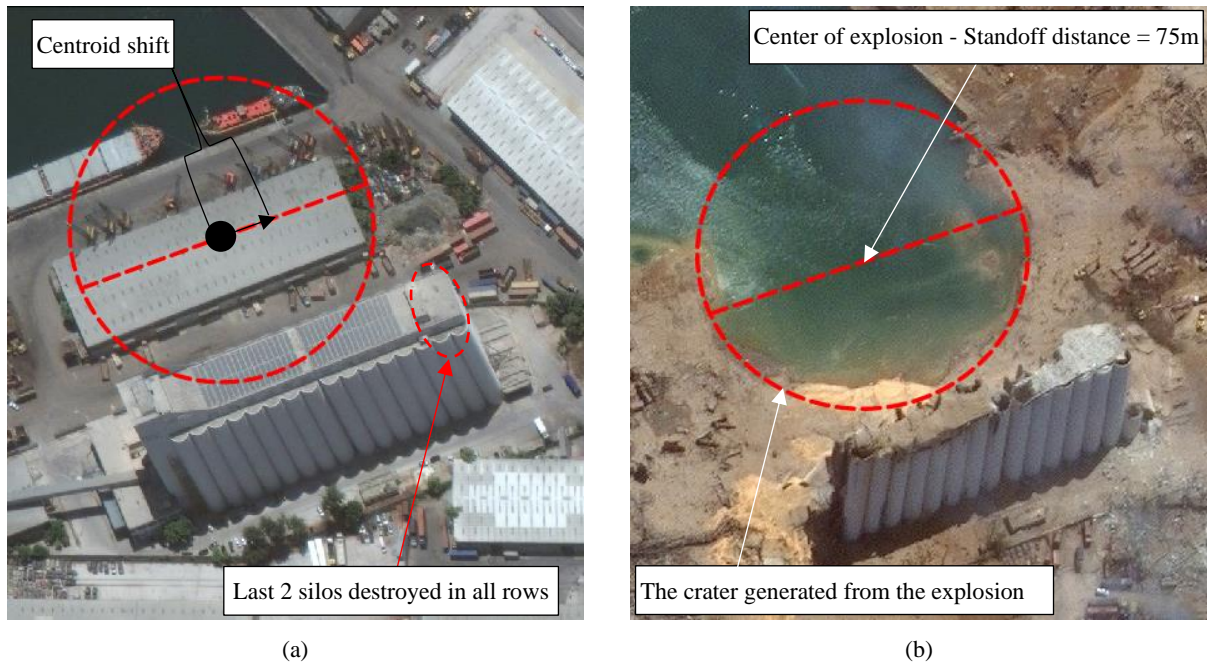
a) Silos' vicinity before explosion b) Silos vicinity after explosion
